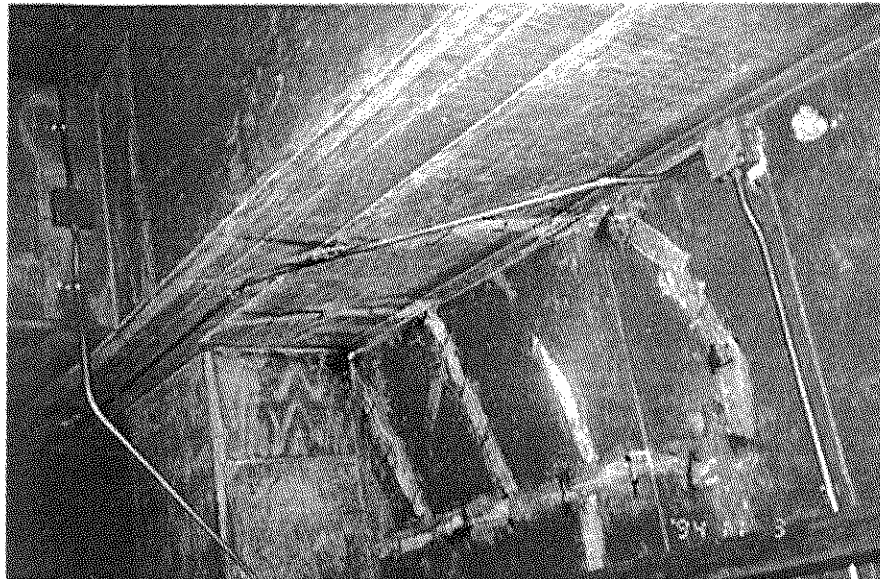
Epoxy repaired cracks in shear wall (Naeim, 2000)
